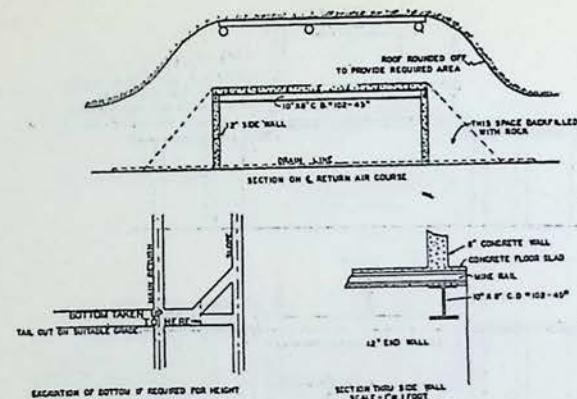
Cross Section of Completed Overcast For Heavy Cover.
